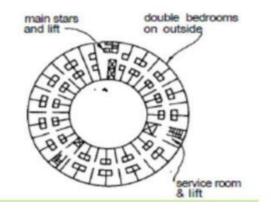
SHOWS CIRCULAR SHAPE ARRANGEMENT
